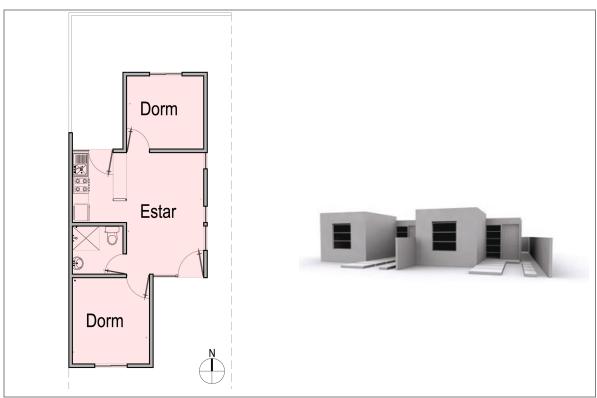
Aislada building type. Floor plan and 3D model, no scale Source: [Campos 2012]
